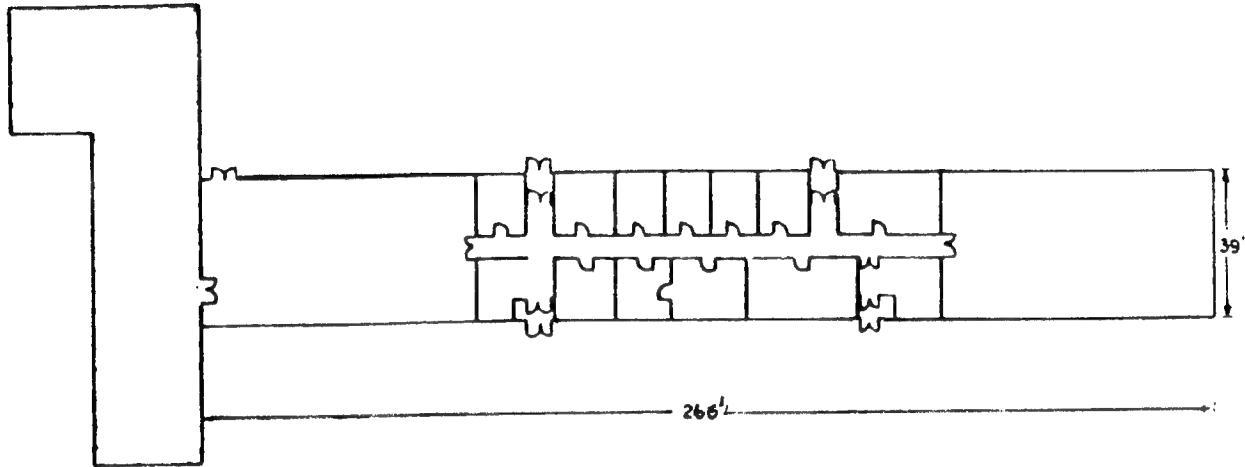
Floor Plan: L-Shaped Barracks (First Floor, General).
